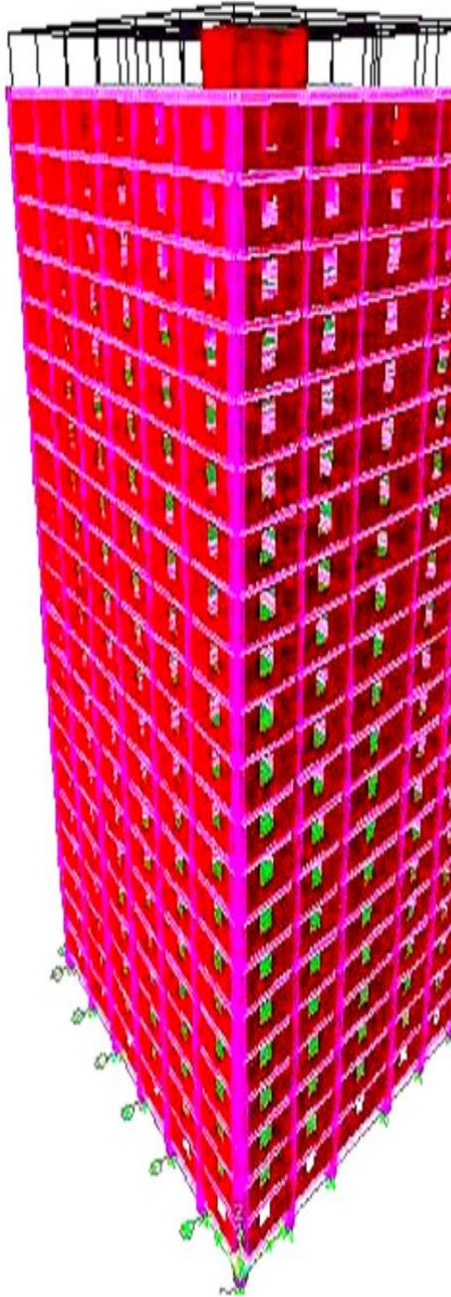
3D view of a G+ 20-story structure with infill walls with a height of 64.5m.
